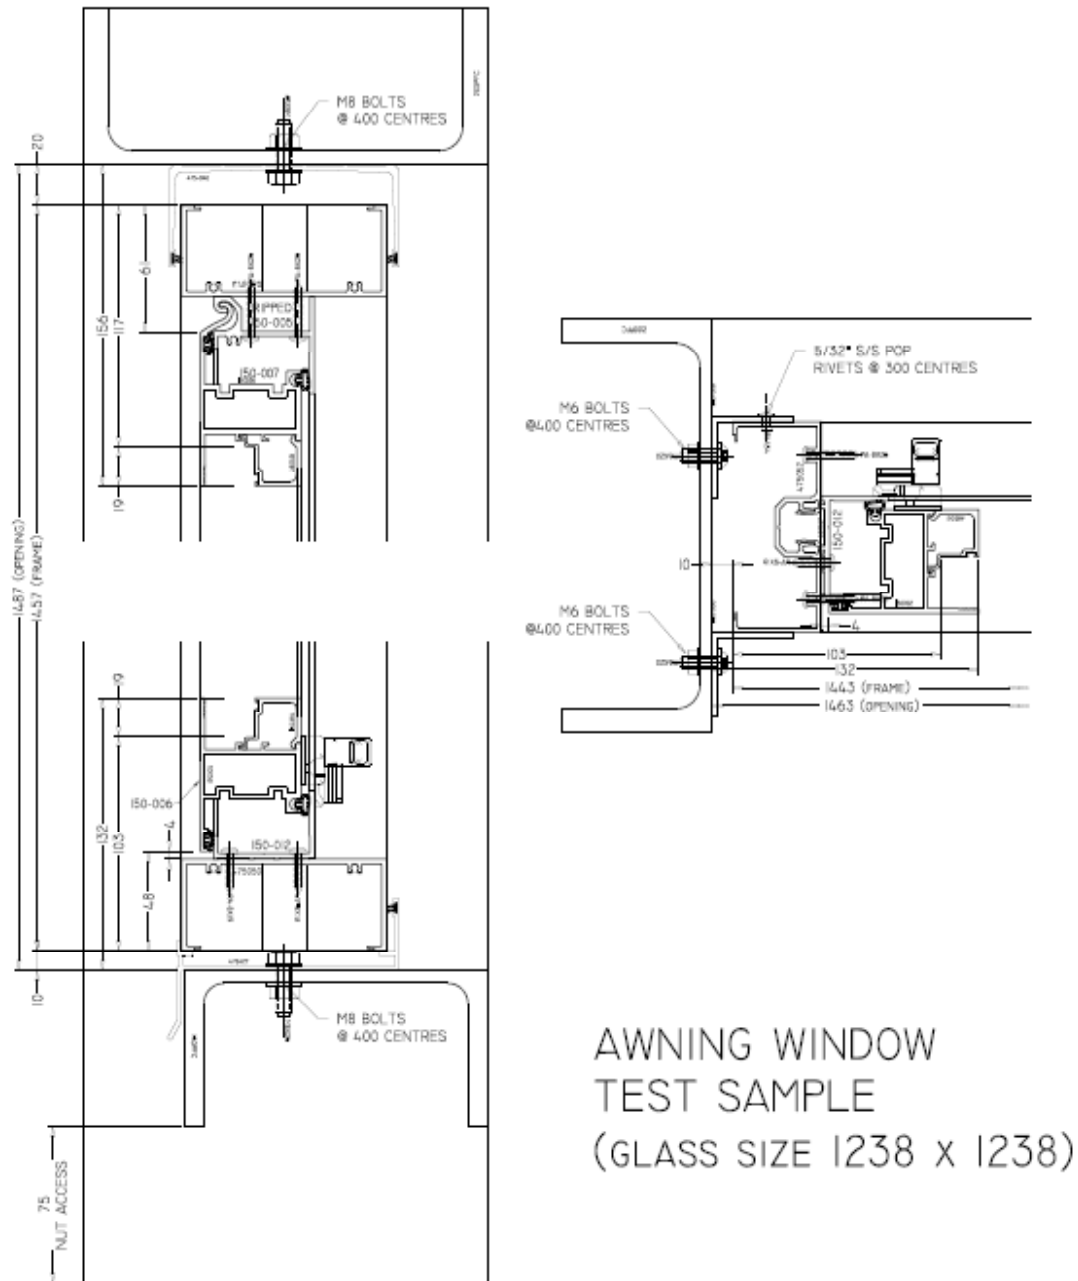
Detail drawing of window aluminium extrusion frame assembly
